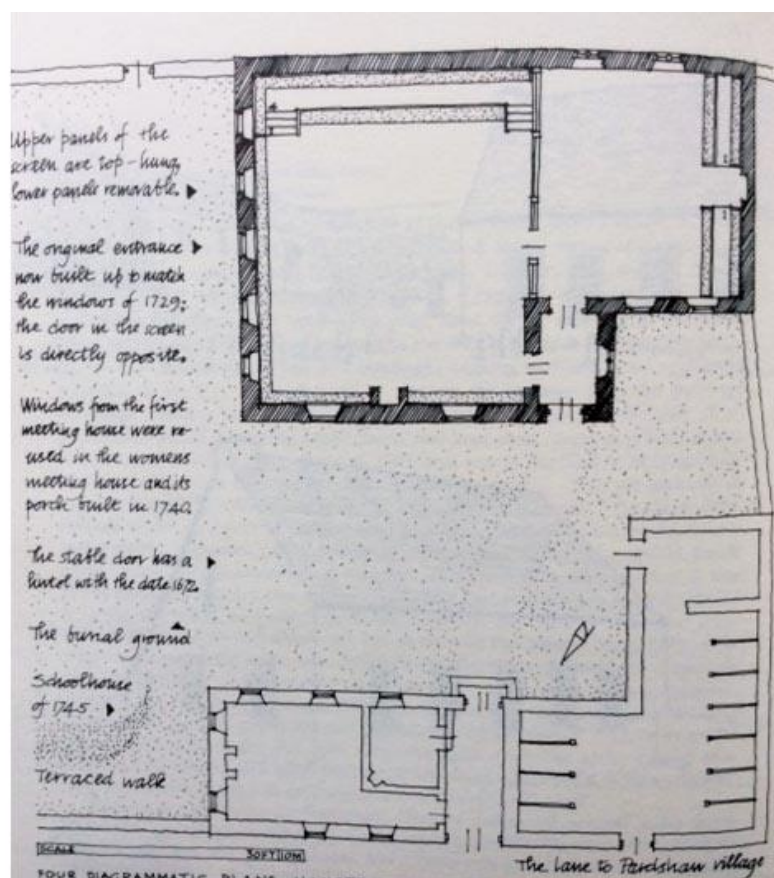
plan of meeting house, schoolroom (below left) and stables (below right), as reconstructed by Butler (1978, p42). Not to scale.
